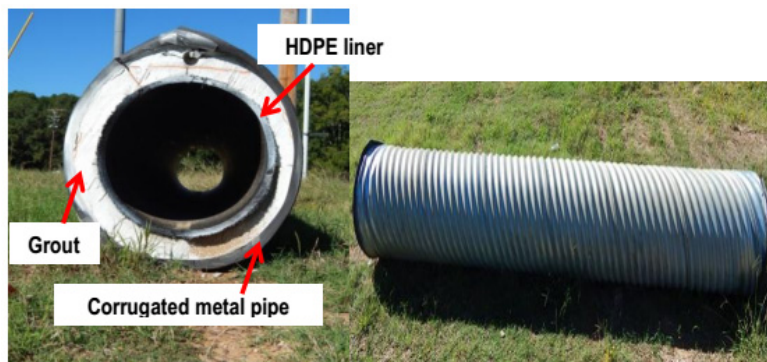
Photograph of slip lined corrugated steel pipe constructed for laboratory testing.
